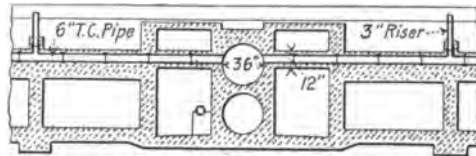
Section of portion of trickling filter at Baltimore, Md.
